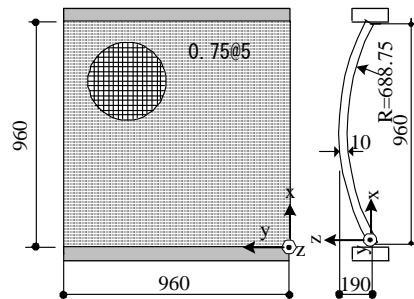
Geometric dimensions of R/C cylindrical shell (mm).
